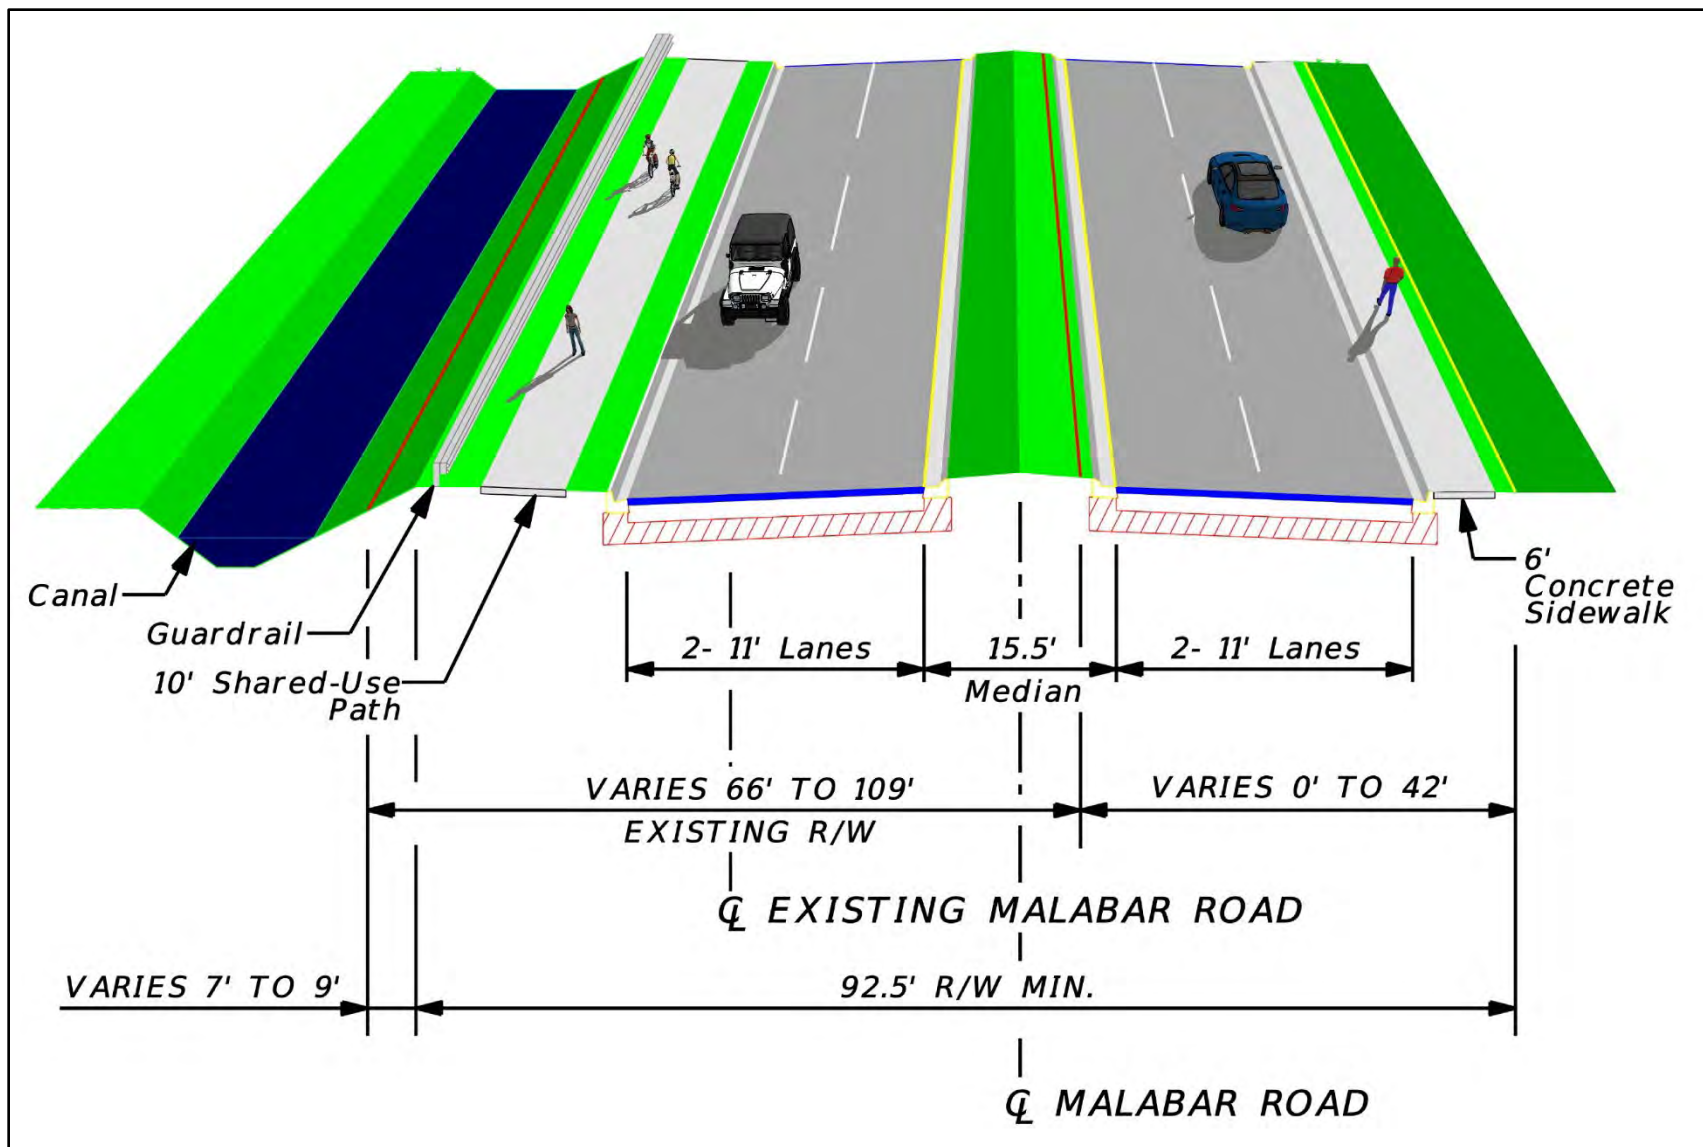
92.5' Alternative A – Canal C-10 to Sta. 256+80
